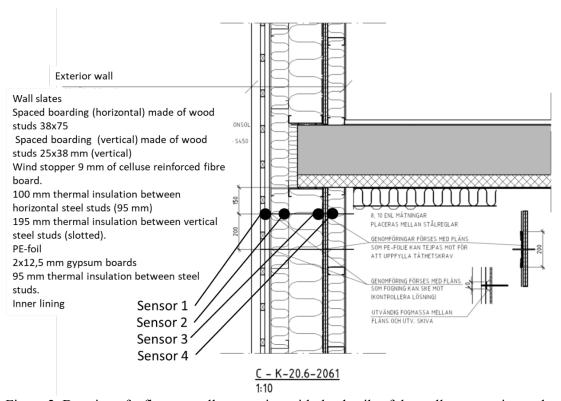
Drawing of a floor to wall connection with the details of the wall construction and a description of where the sensors are installed.
